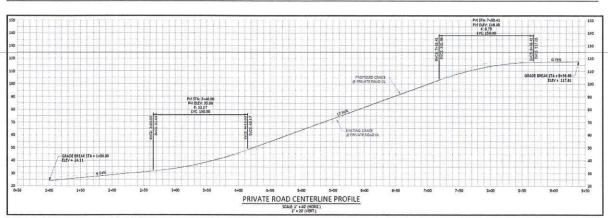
Concept elevation profile of proposed maximum 18 percent grade private road.
